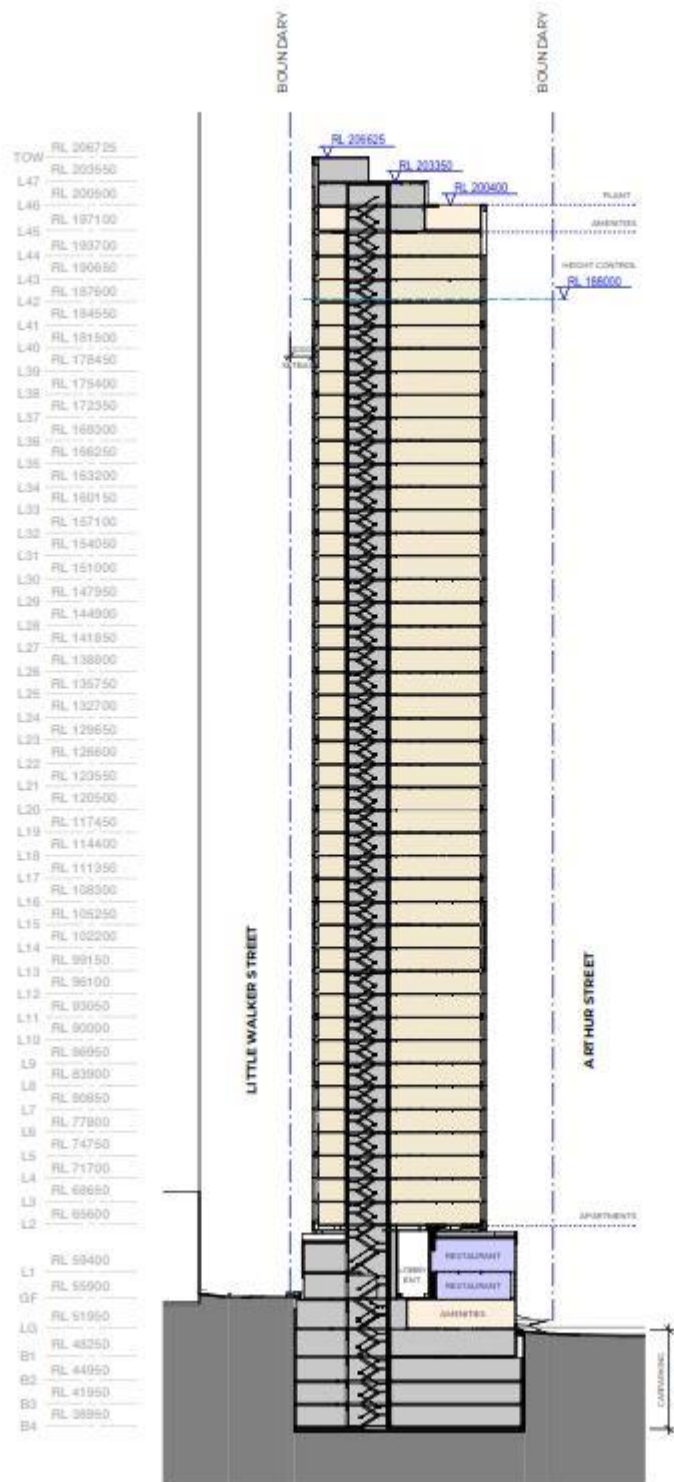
Woods Bagot Section East/West Drawing DA-1320 RevA (dated 05.03.2024).
